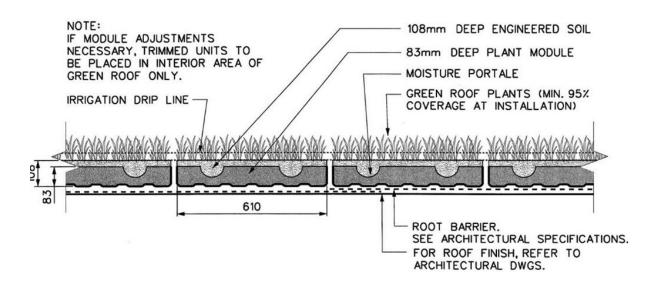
Typical Pre-vegetated Green Roof Module (Source: AECOM)
